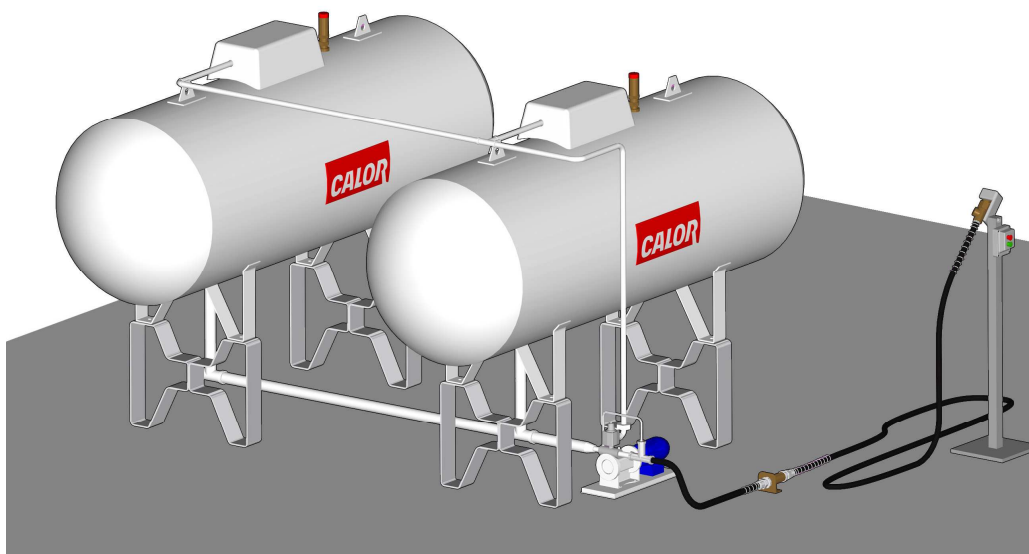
Typical liquid re-fuelling installation, with pump and hose, where the entire installation is a pressure system and subject to the PSSR.
